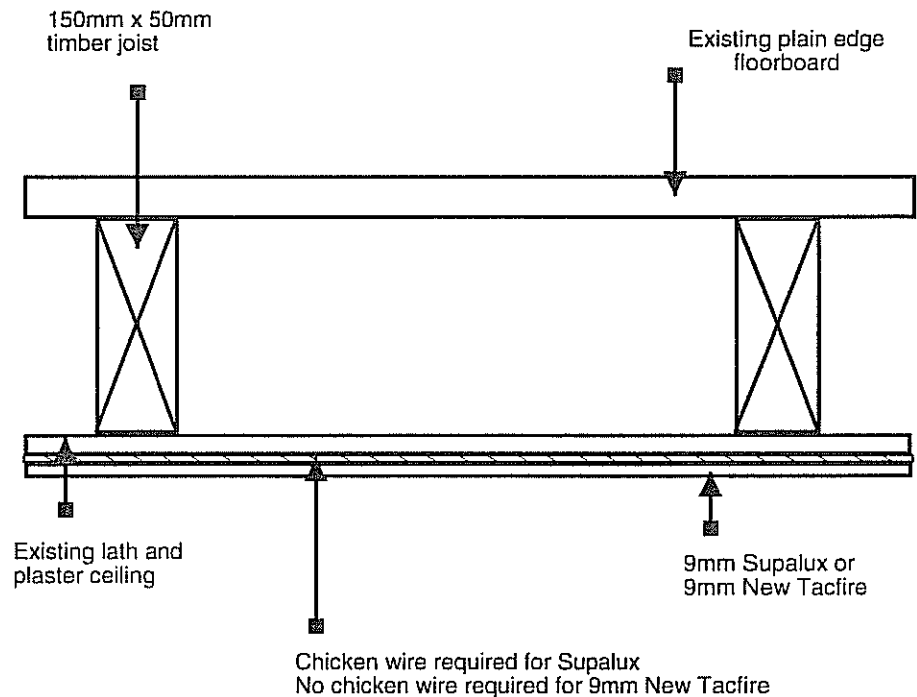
Use of Supalux or New Tacfire below an existing ceiling to 30 minutes fire resistance
